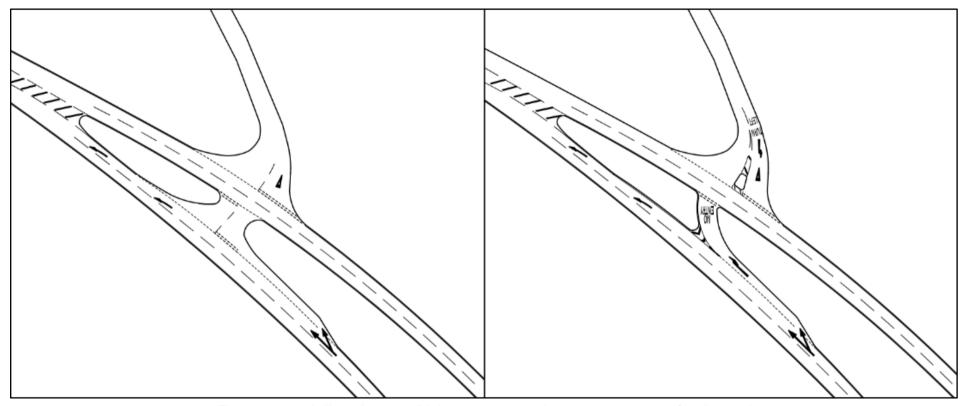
example illustrating a possible layout to prevent right turn manoeuvres out of a minor road
